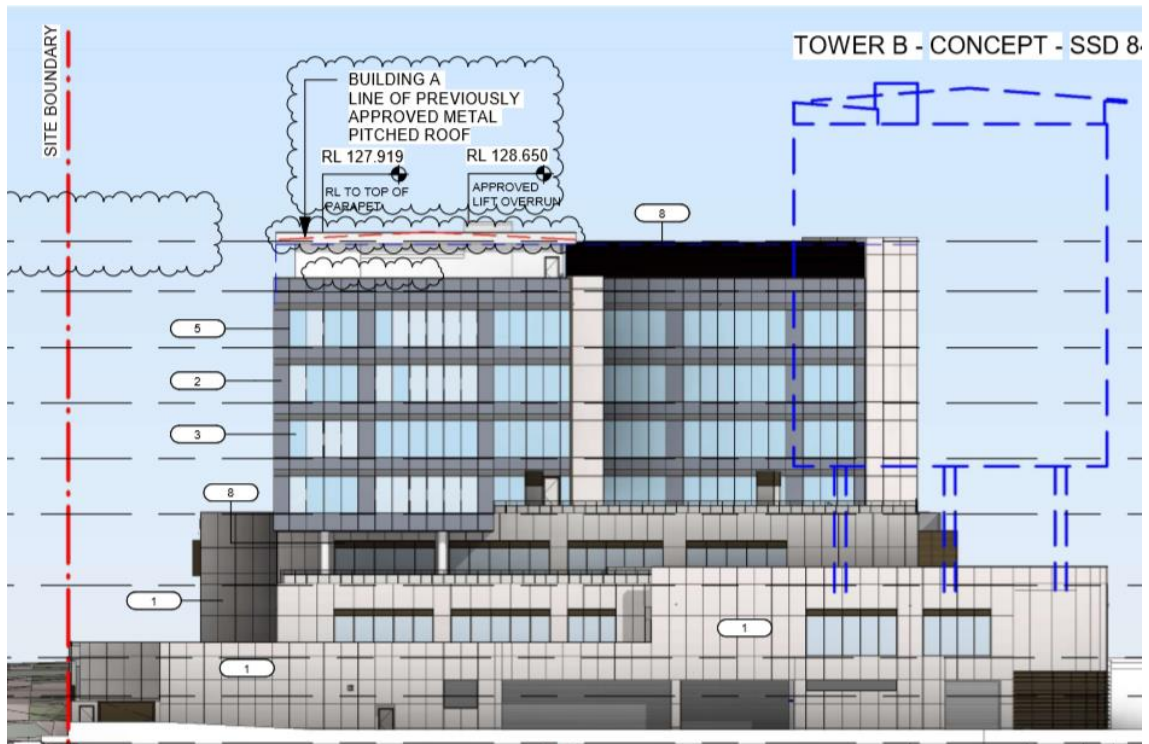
Proposed changes to Tower A – Eastern Elevation (SSD 7543) (Source: Billard Leece Partnership)
